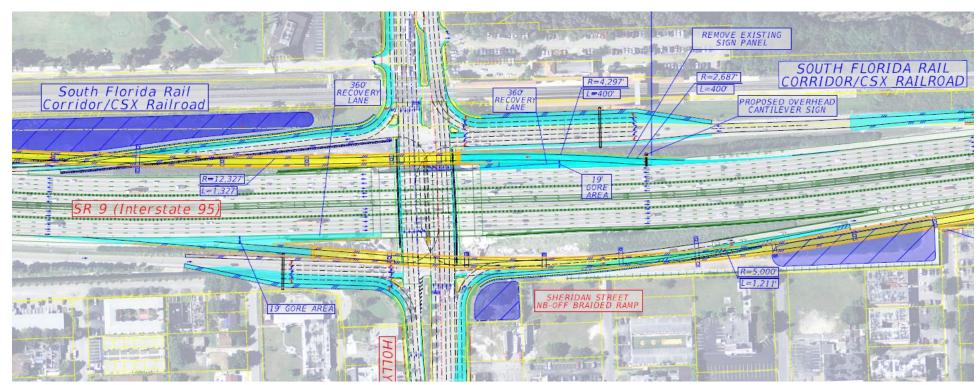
I-95/Hollywood Boulevard Interchange Planning Study Concept
